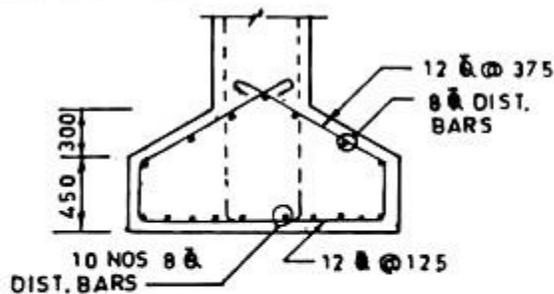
DETAILS OF REINFORCEMENT FOR FOUNDATION RAFT Example 1
